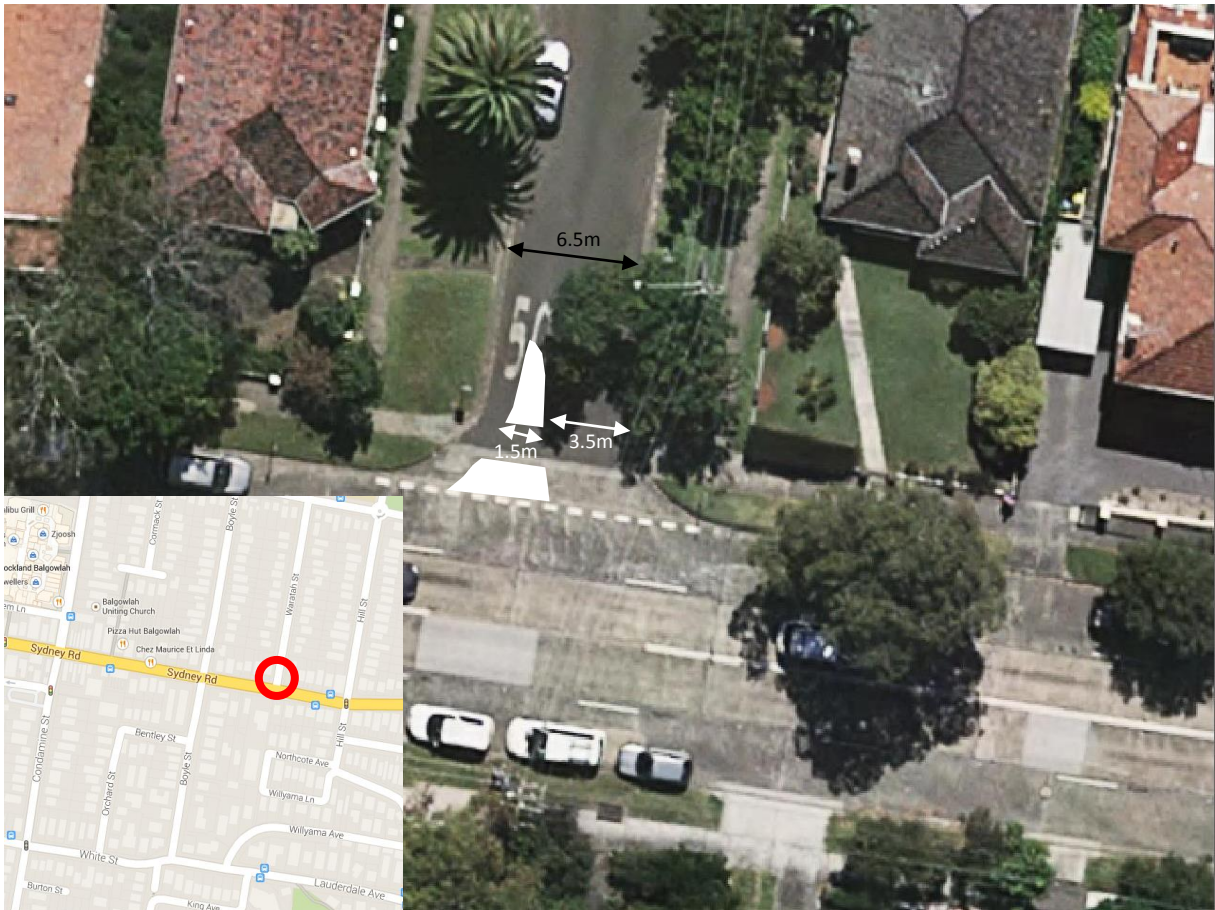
Proposed concept plan of traffic island on Waratah Street at the Sydney Road intersection, Balgowlah
